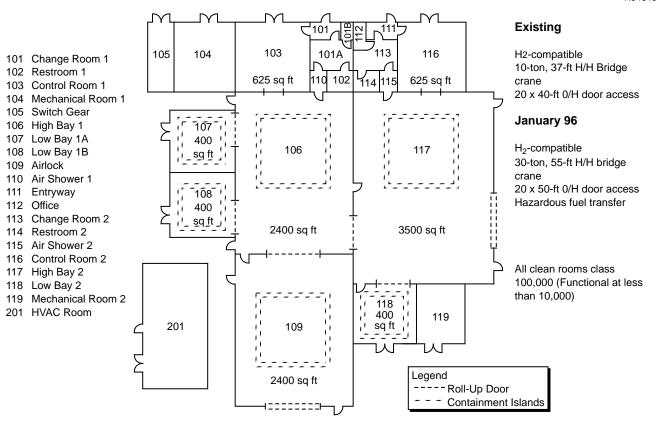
Astrotech Payload Processing Facility-Building 1032
